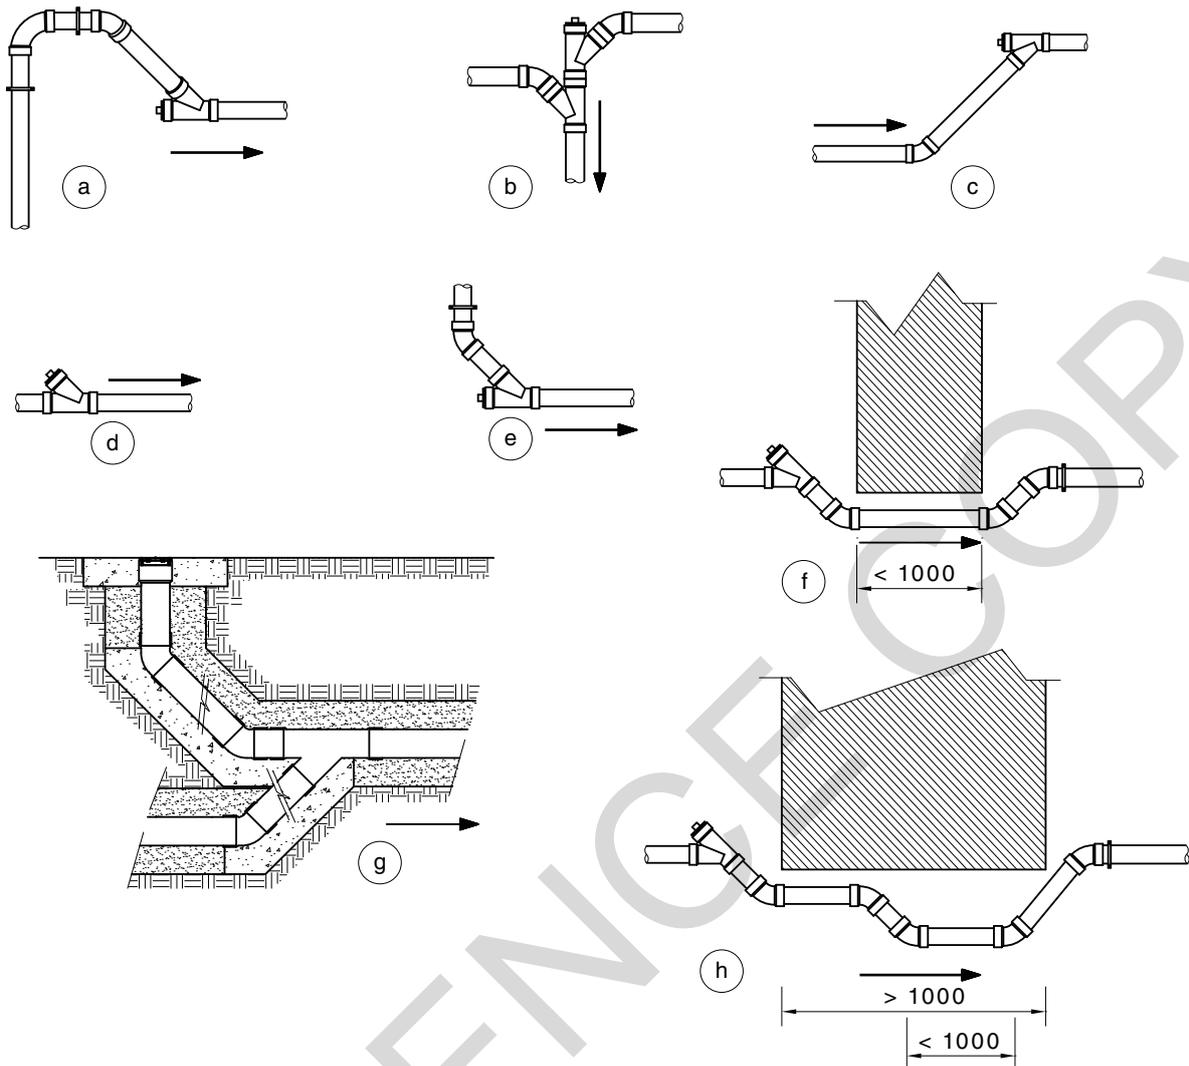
TYPICAL LOCATIONS OF INSPECTION OPENINGS
